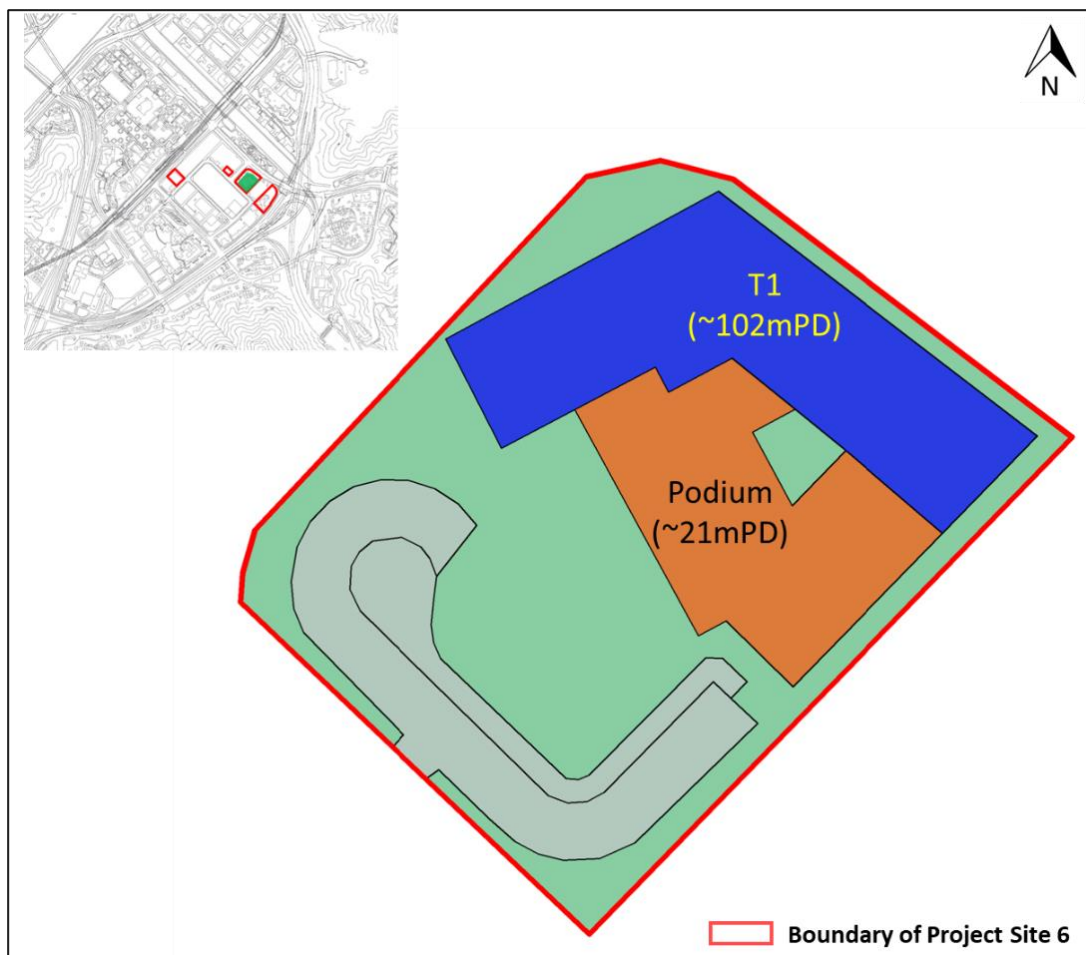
(f) Building Layout of the ALVA Hotel by Royal within Project Site 6
